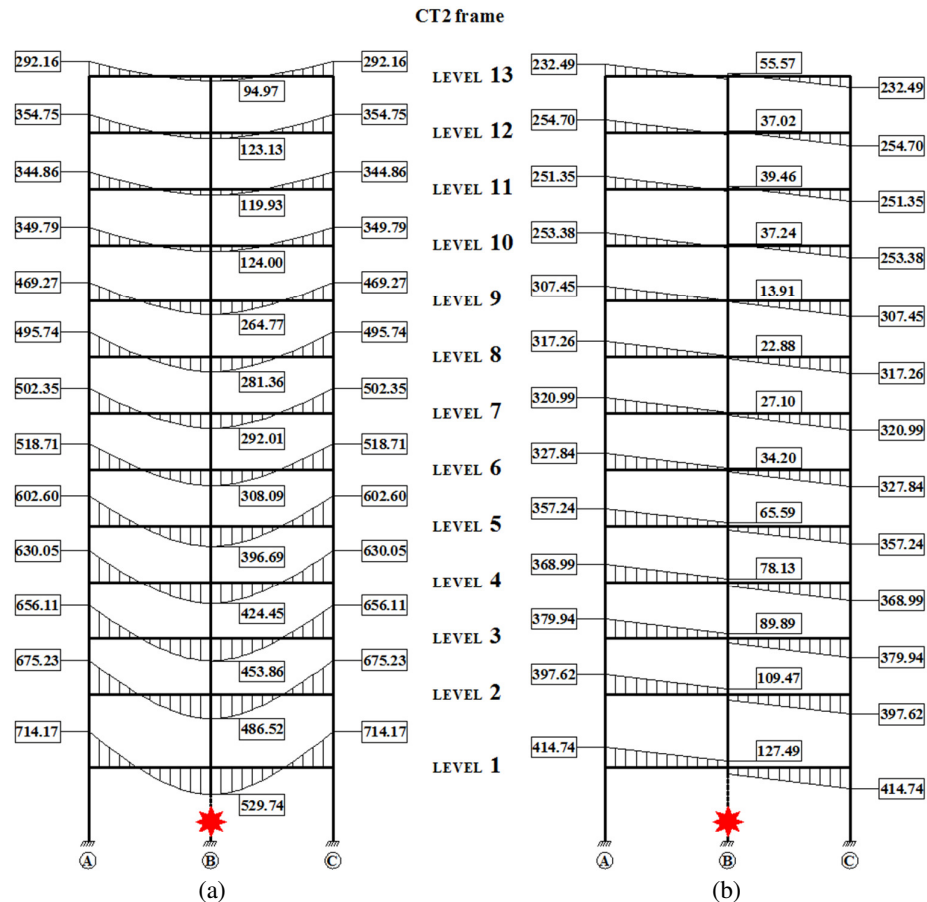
Damaged structure – longitudinal frame CT₂: a) bending moments [kNm]; b) shear forces [kN]
